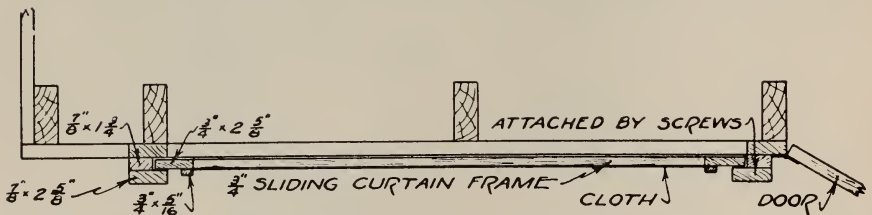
Detail showing installation of a sliding curtain. The dimensions and location of studding in above figure are shown on floor plan figure 26. The curtain frame is of simple construction. The retaining strip on one side is attached with screws as indicated so that it can be easily detached in order to remove the curtain frame.
